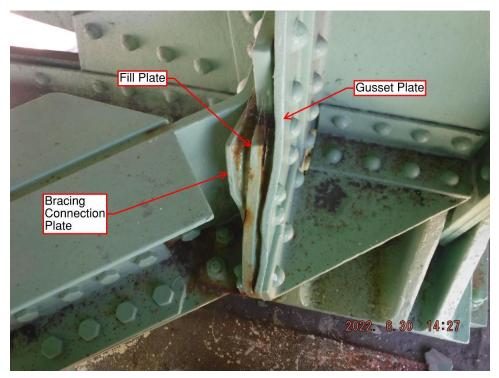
Reactivating pack rust between gusset, fill plate, and bracing connection plate (Span 11, North Truss, LO, South Gusset behind bearing shown)
